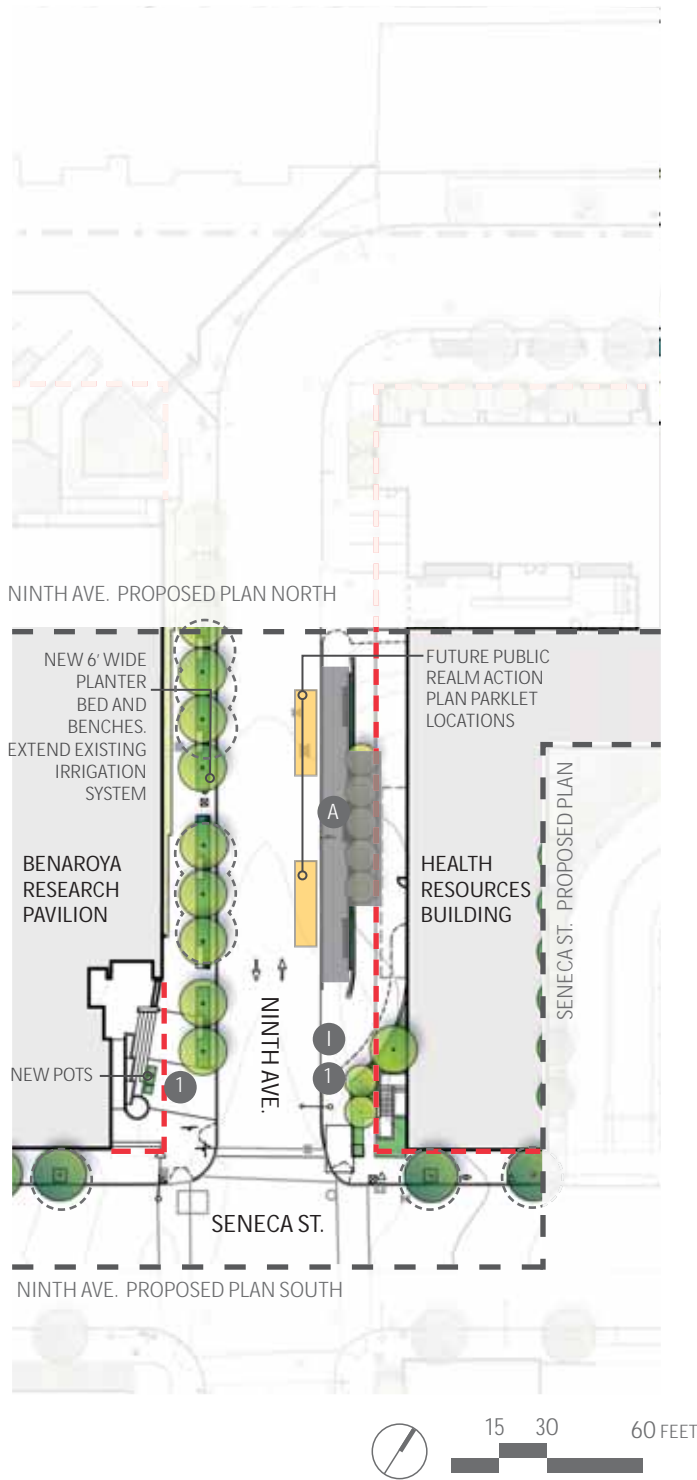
NINTH AVENUE PROPOSED PLAN
